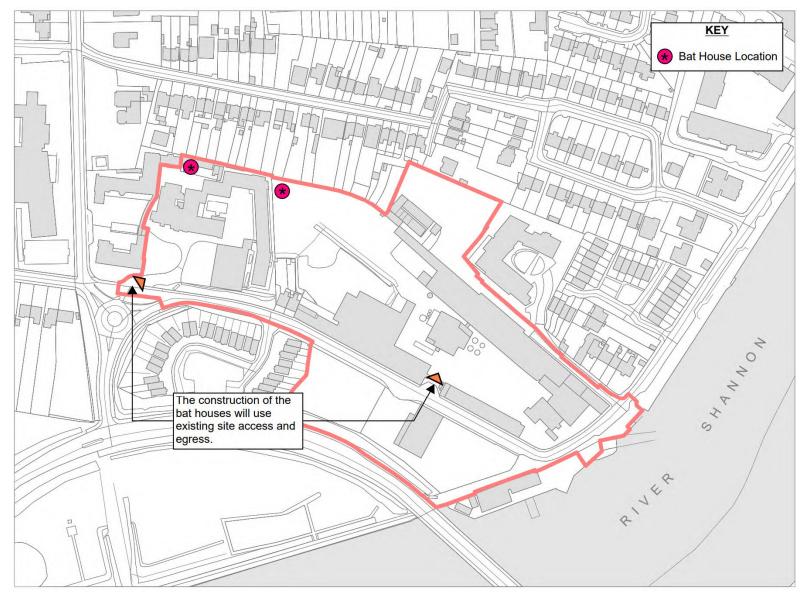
Construction and Logistical Considerations Stage 1 - Bat Houses
